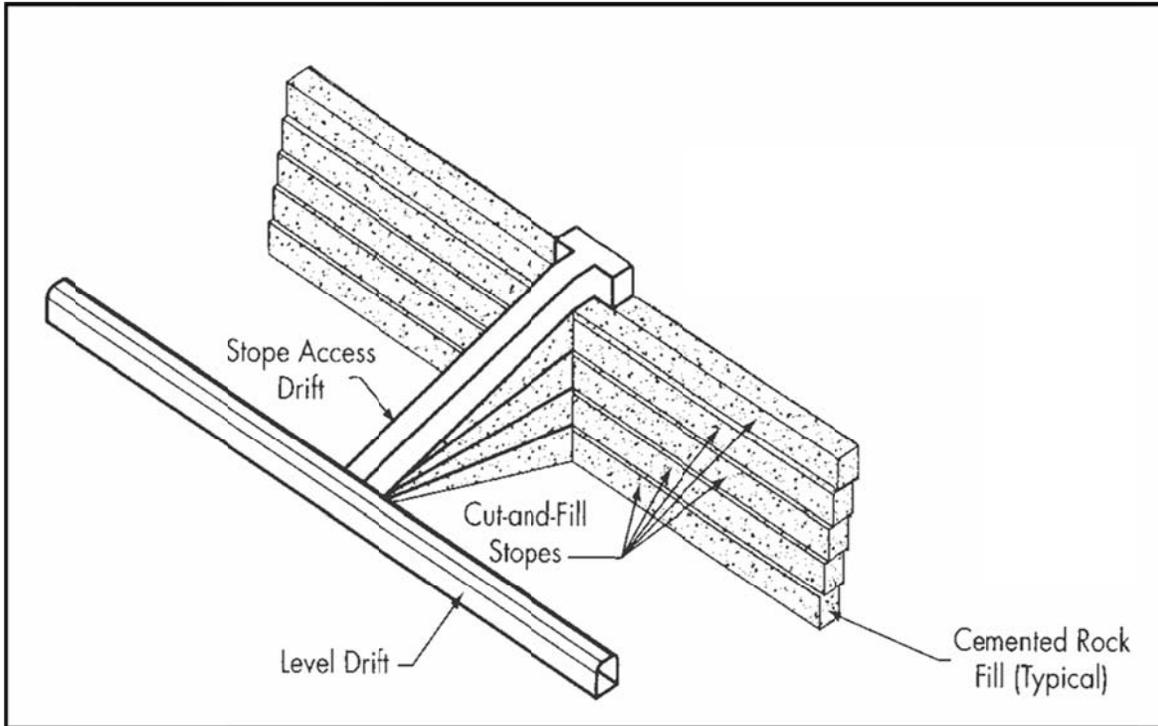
Typical Historic Overhand Mechanical Cut and Fill Stope – Isometric View
